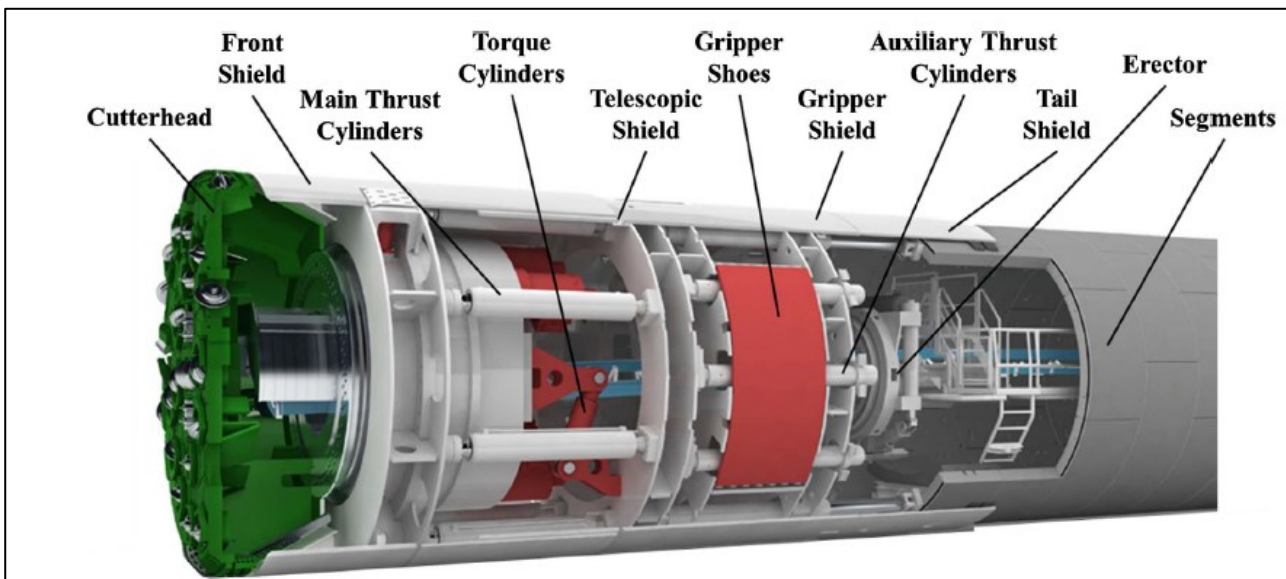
Principal components of a double shield TBM (Herrenknecht AG).
